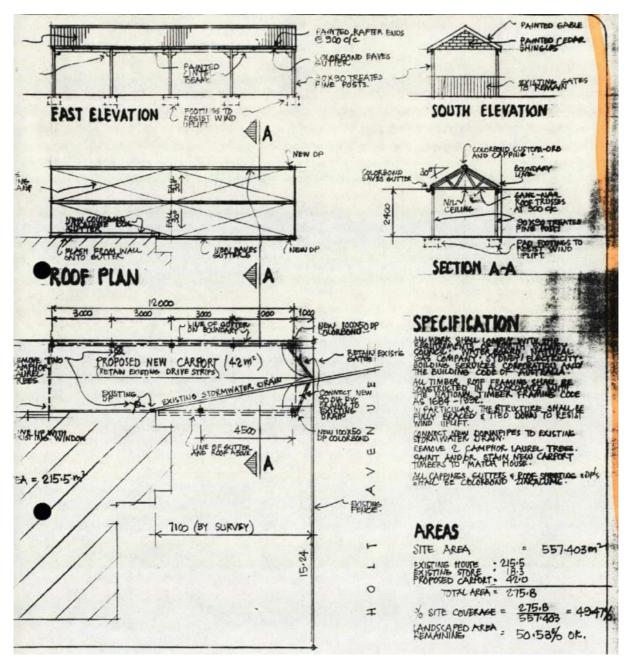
Part sections and elevations plan for proposed double carport, 121 Holt Avenue, 1994. (Source: North Sydney Council, P339/121/3)
